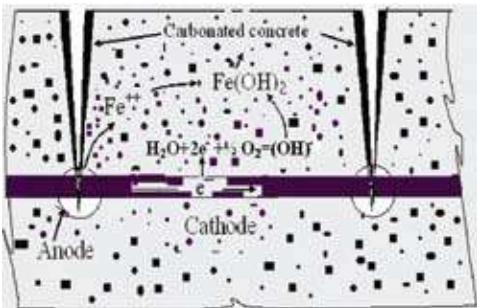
Mechanism of Corrosion of Steel in Concrete – Schematic
